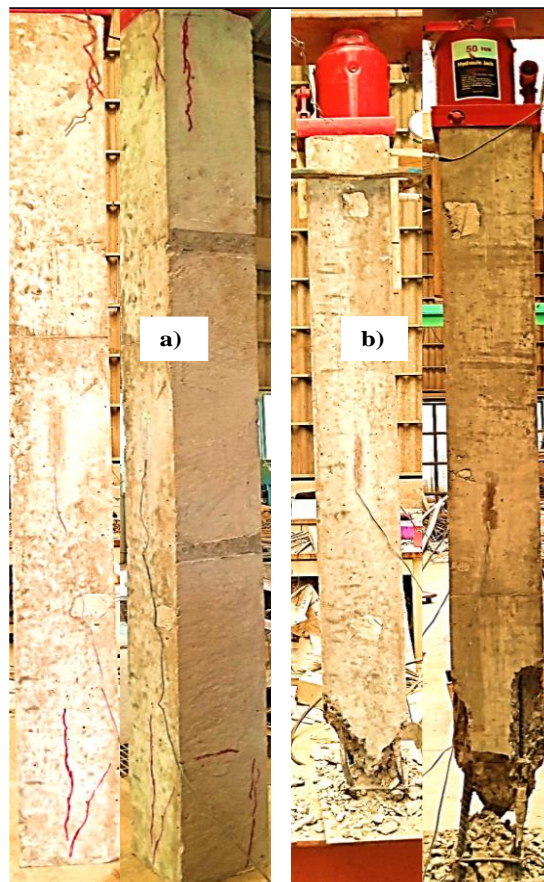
Failure mode of the control specimen: a) Crack pattern; b) Failure
